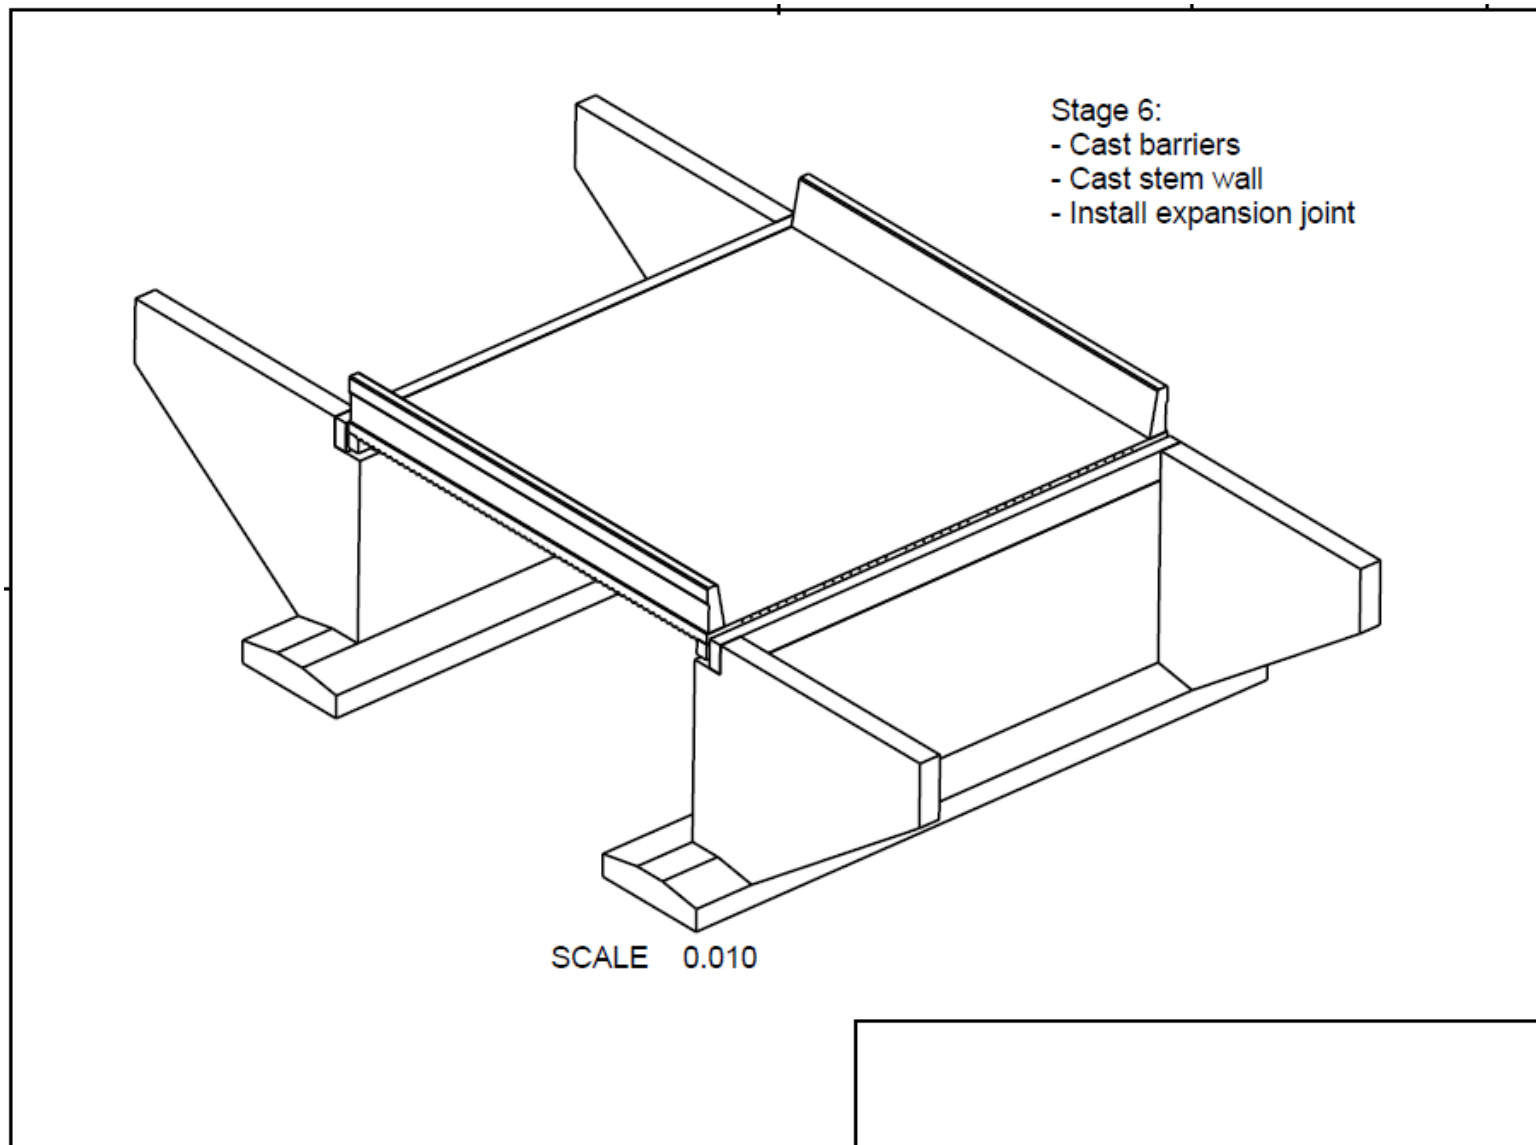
Cast-in-place barriers, complete stem wall, and install expansion joint
